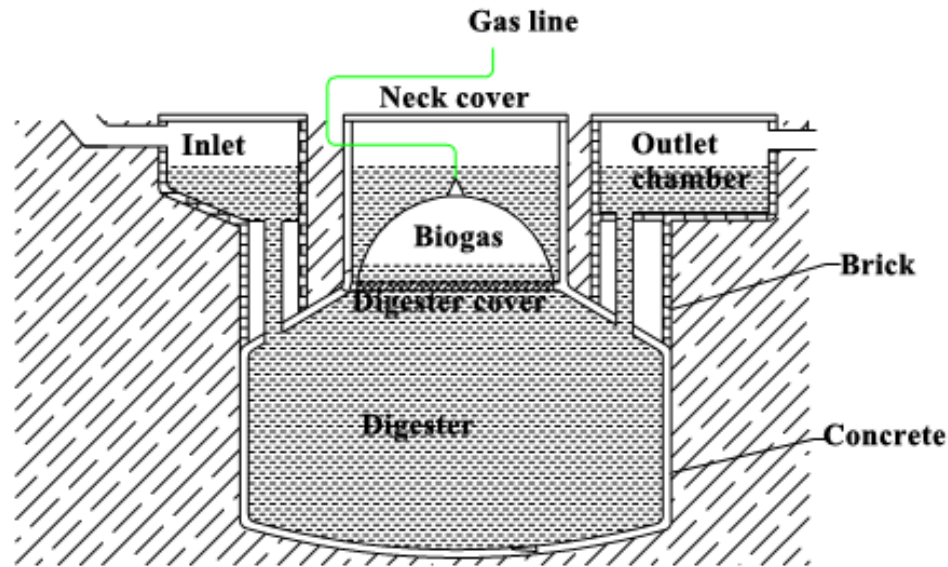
The In-situ cast concrete digester (SPST Co. Ltd., n.d.)
